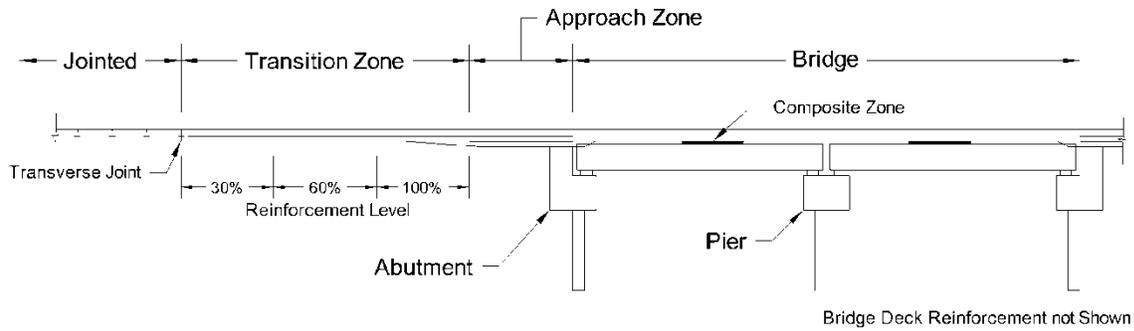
Seamless paving over bridge transitioning to jointed pavement.
